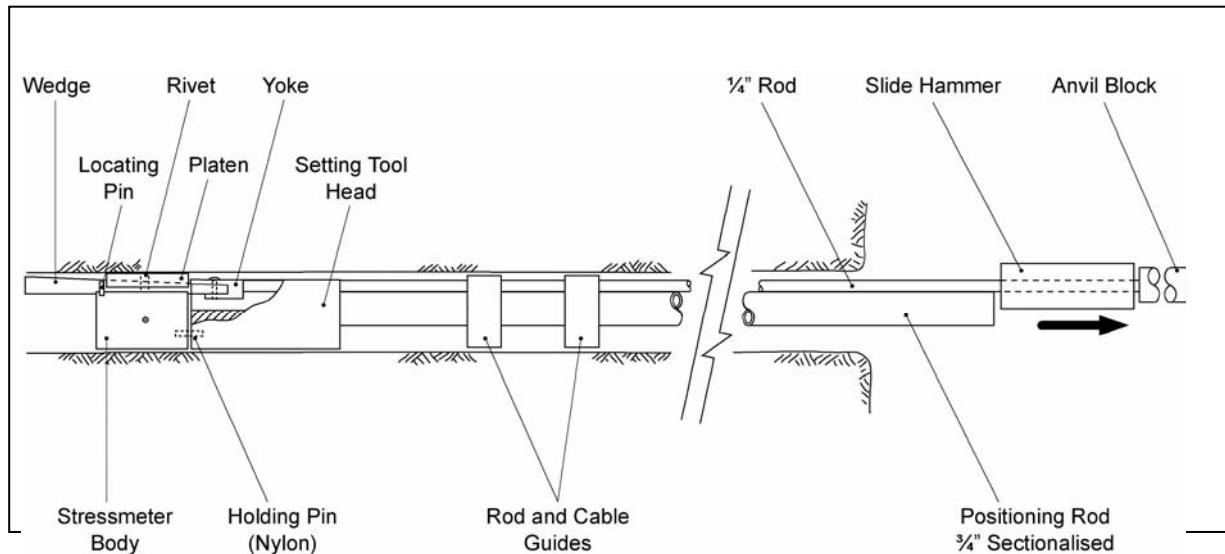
Vibrating Wire Stressmeter installation tool assembly.
